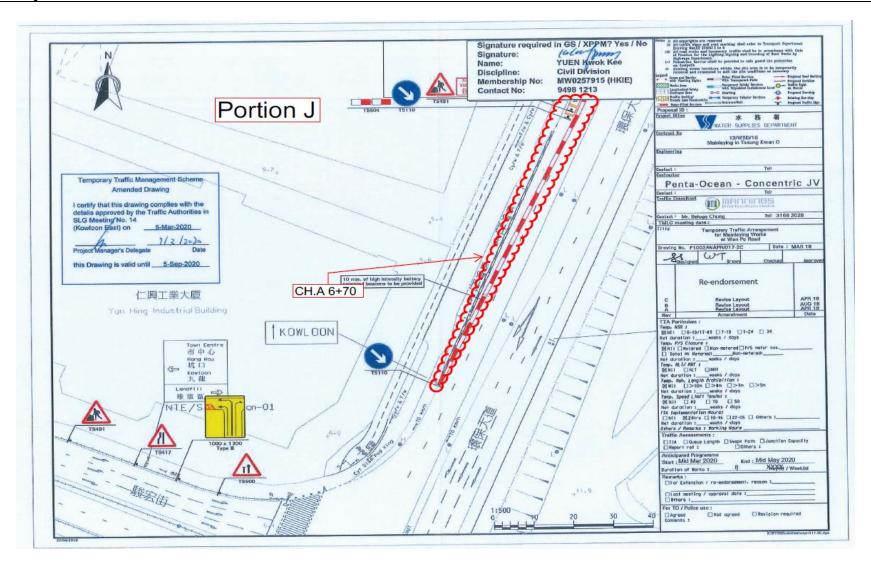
(ii). Location Plan for Portion J - CH.A 6+70
